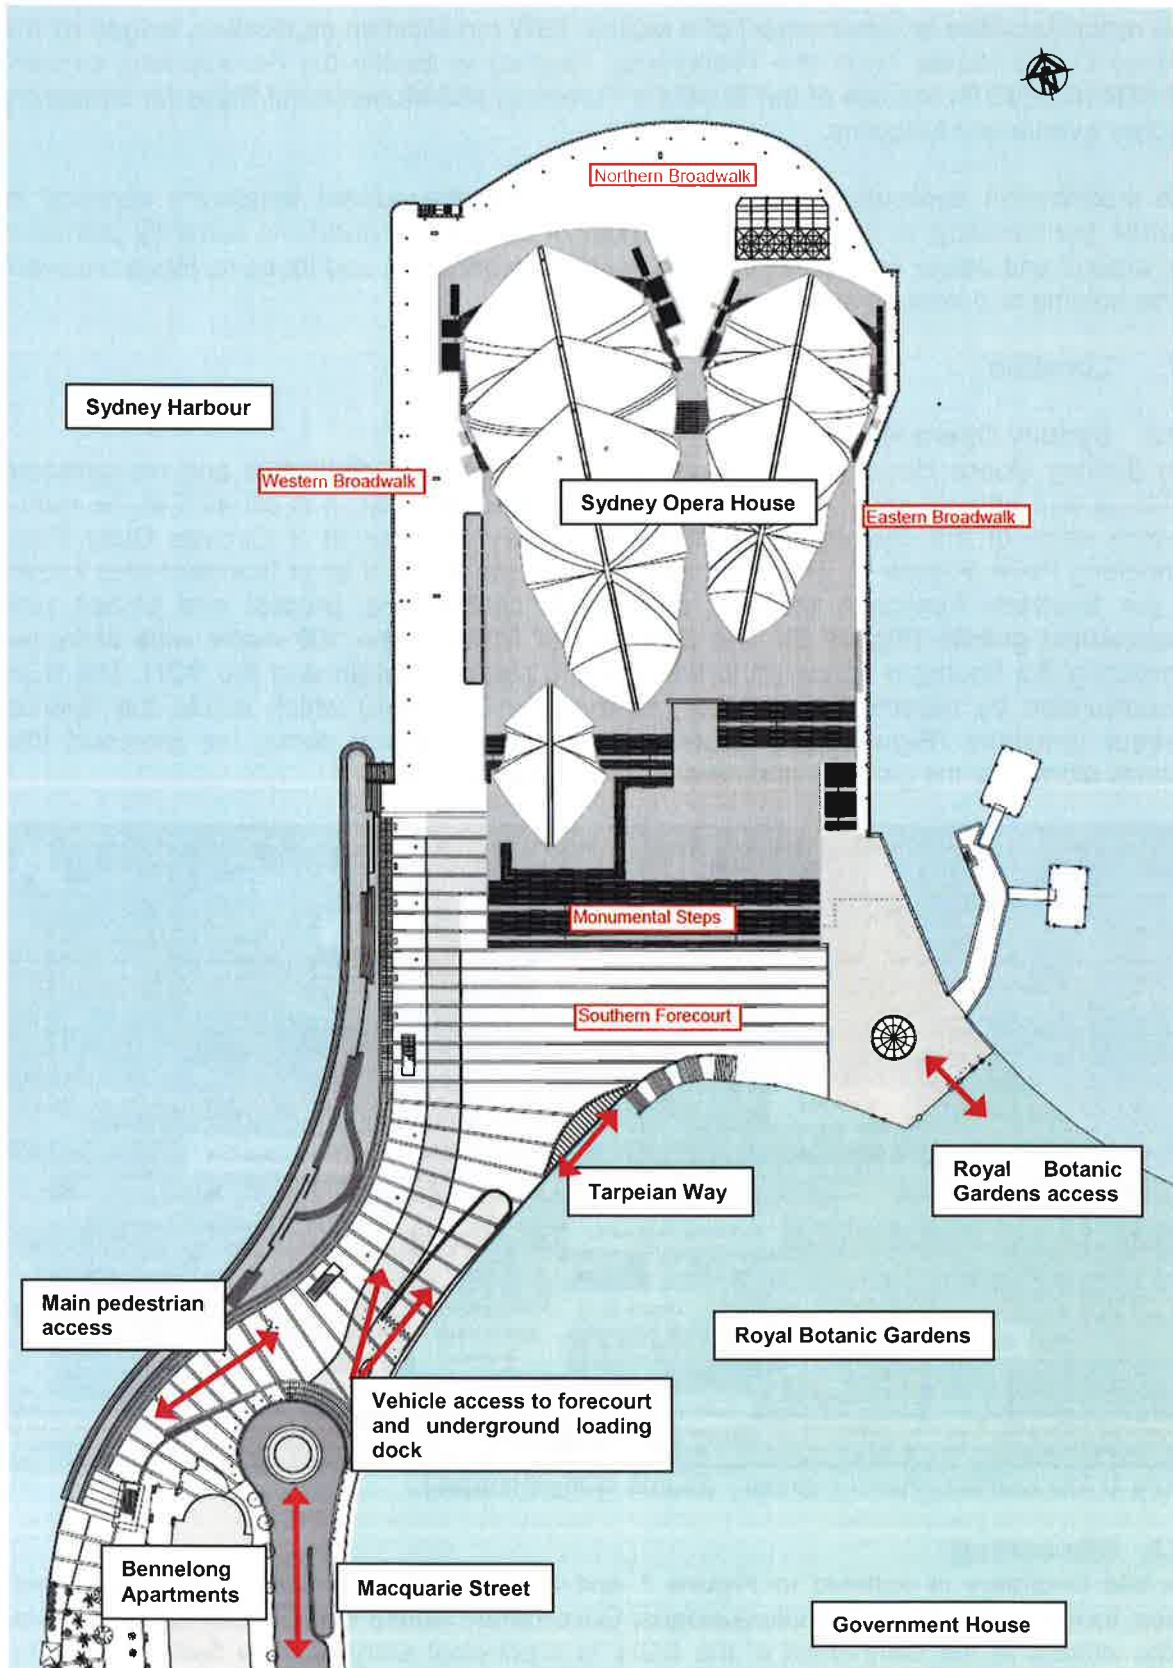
Site plan showing location of outdoor events and functions (Source: EA)
